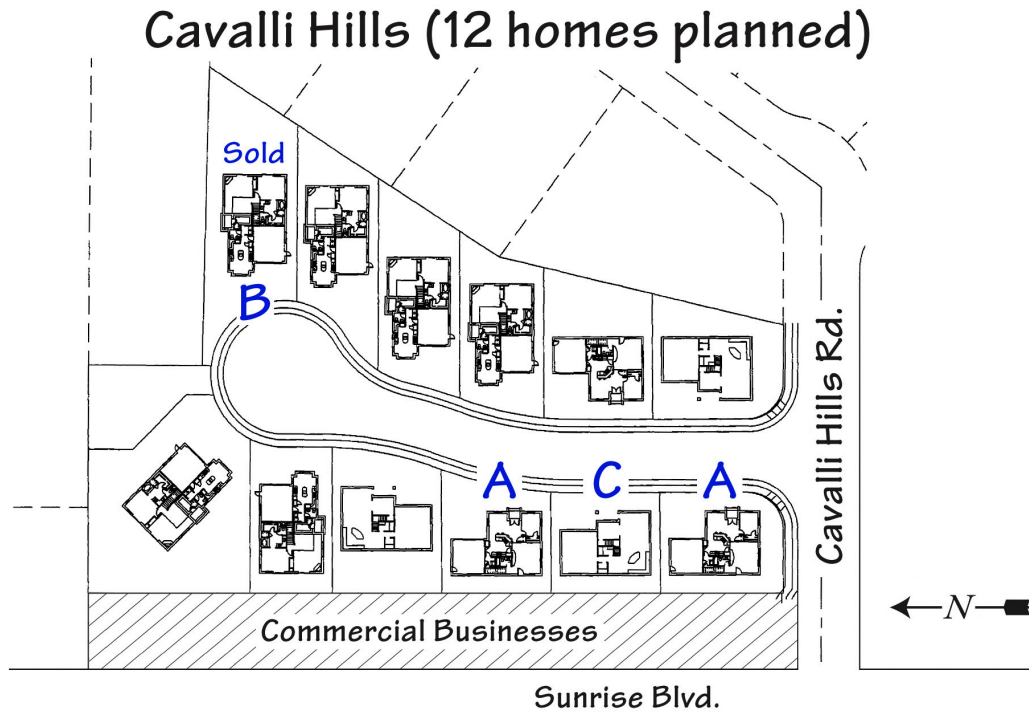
Plan view of the A, B and C style homes being built in Cavalli Hills subdivision, Sacramento, Ca.
